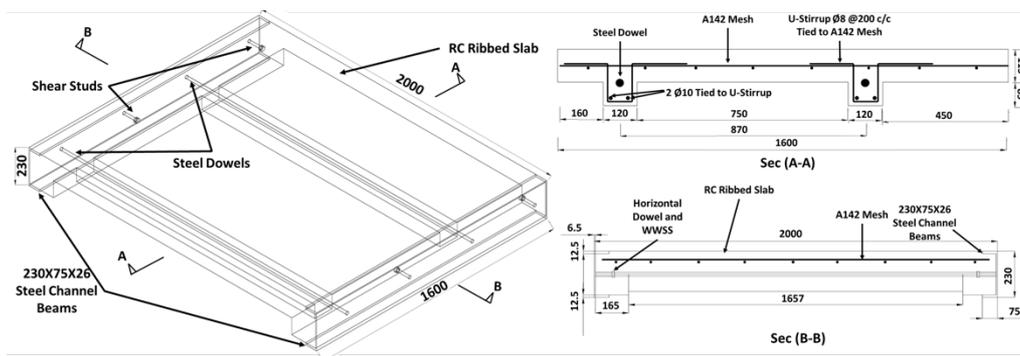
Schematic Drawing of Typical 1.6m Segment of a PUSS Flooring Unit with Steel Dowel and WWSS Shear Connection System [6]
